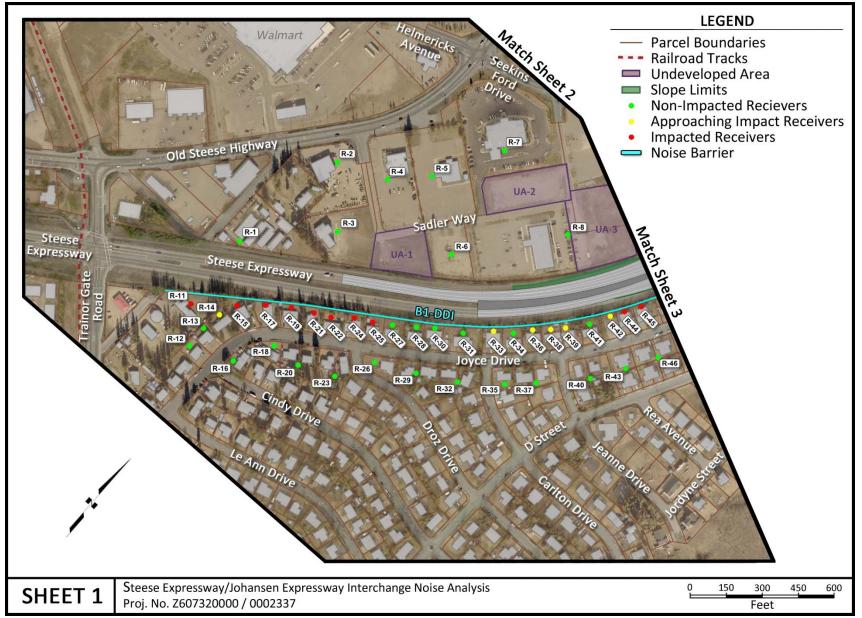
Diverging Diamond Interchange Noise Impacts and Proposed Barrier Walls, Sheet 1
